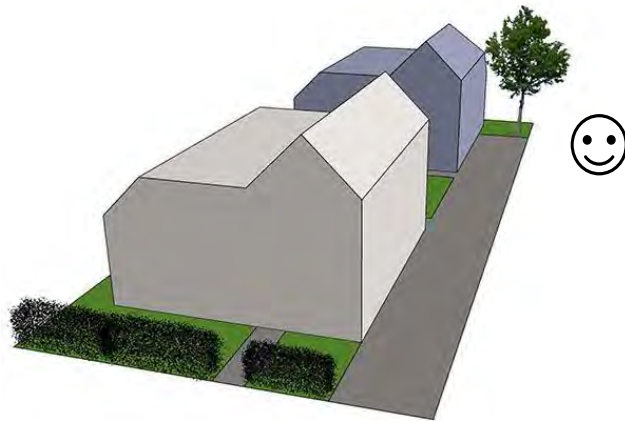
New dwellings should not be located in front of an existing house on a front site. Where site depth exceeds width, new dwellings only need to comply with 2GP standards.
